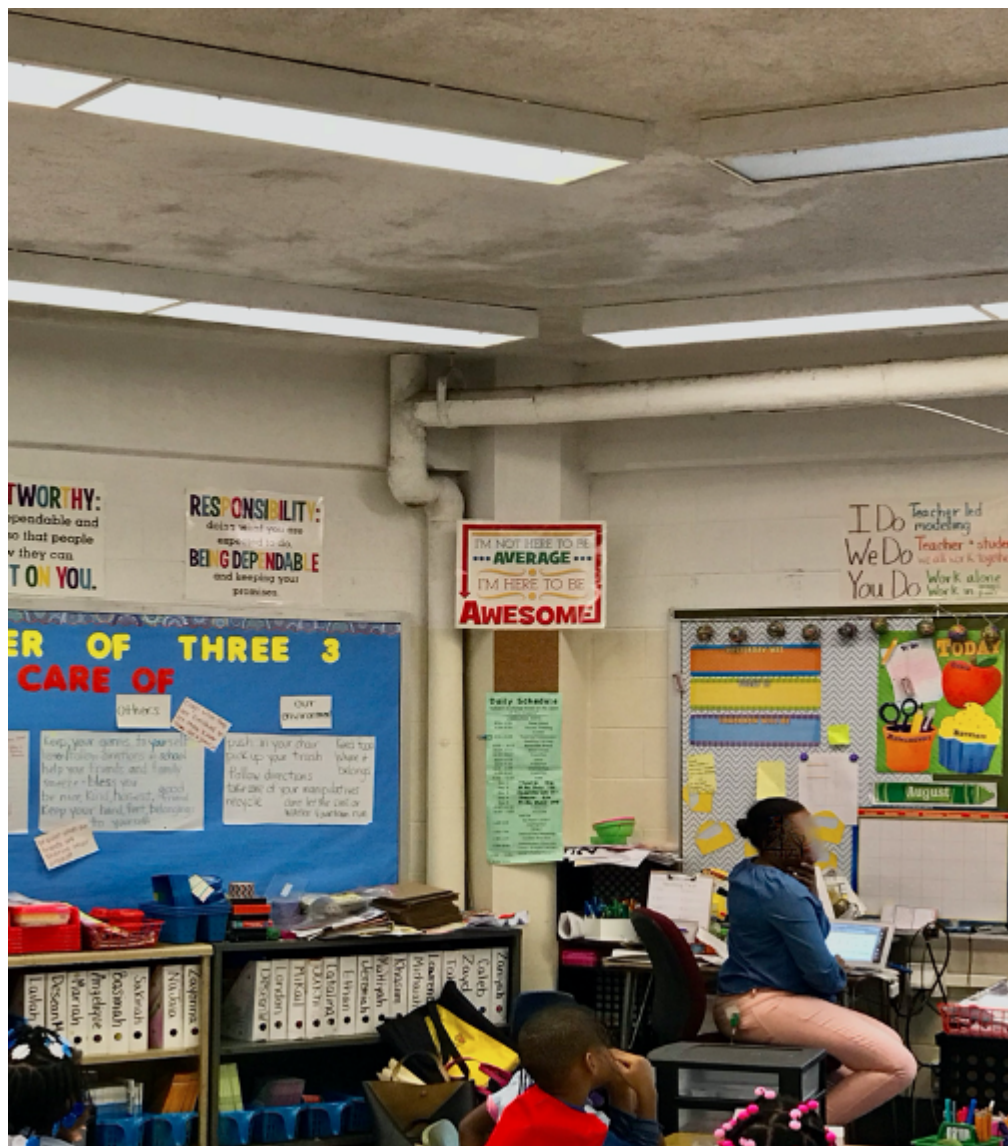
Mold Growth on Ceiling and Wall of Occupied ES Classroom
